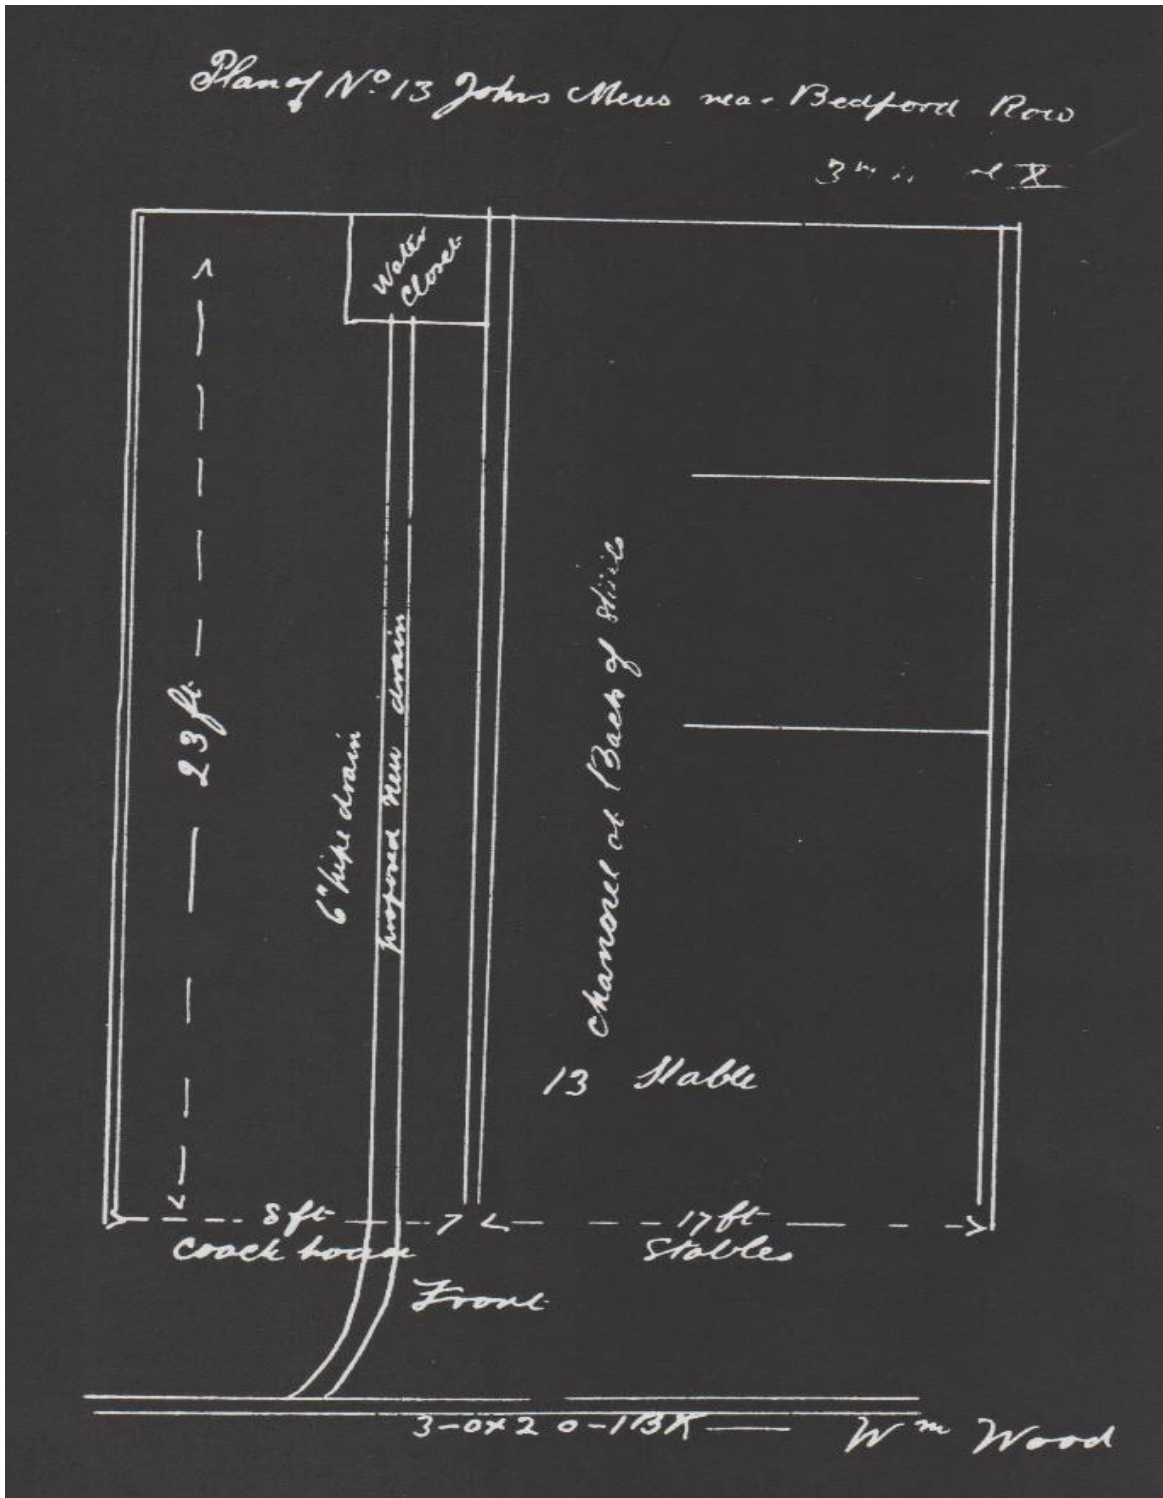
the ground plan of 13 Johns Mews in 1854 (Camden drainage plans)
